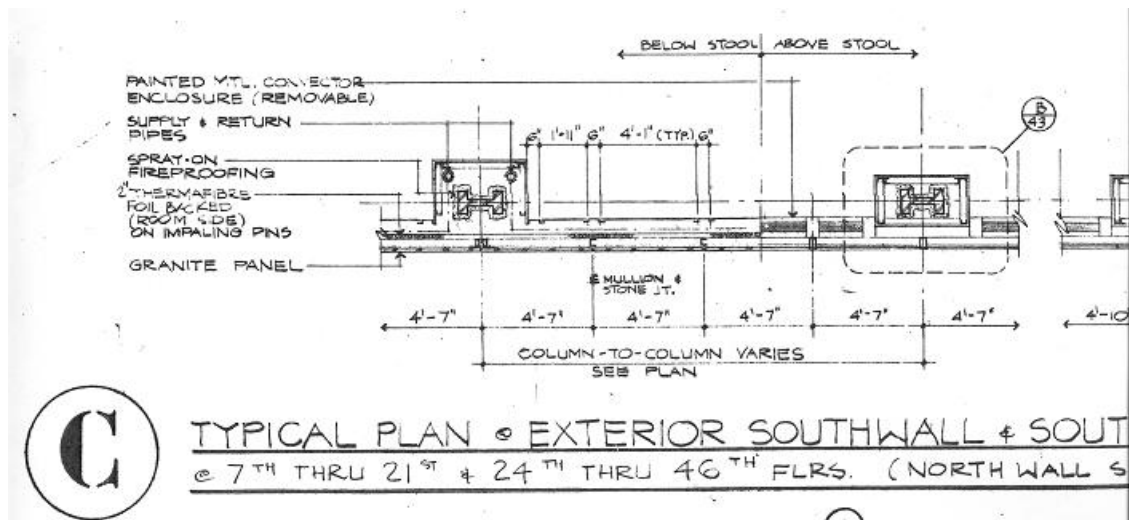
WTC 7 Architectural Drawing 38, Section C: Typical Plan at Exterior Southwall and Southeast Corner.
